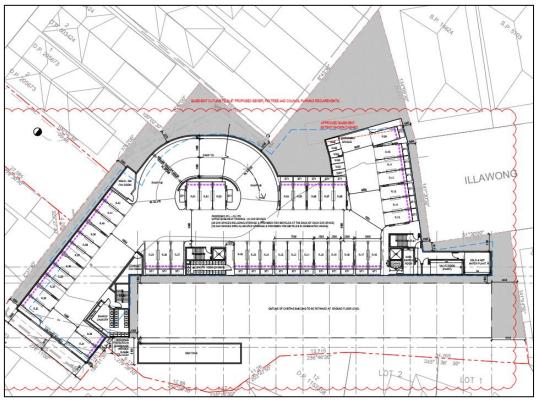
Extract of Approved Upper Basement Floor Plan, DA-125/2012/A – 20 Illawong Avenue, Tamarama Source: Group GSA
